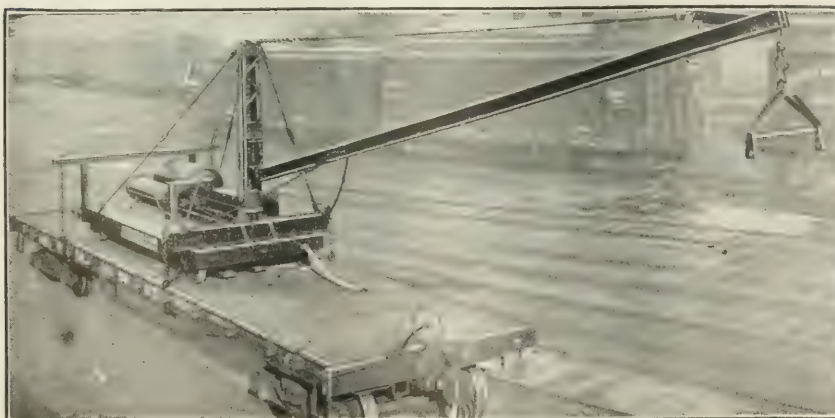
PORTABLE RAIL-HANDLING DERRICK MOUNTED ON A FLAT CAR
